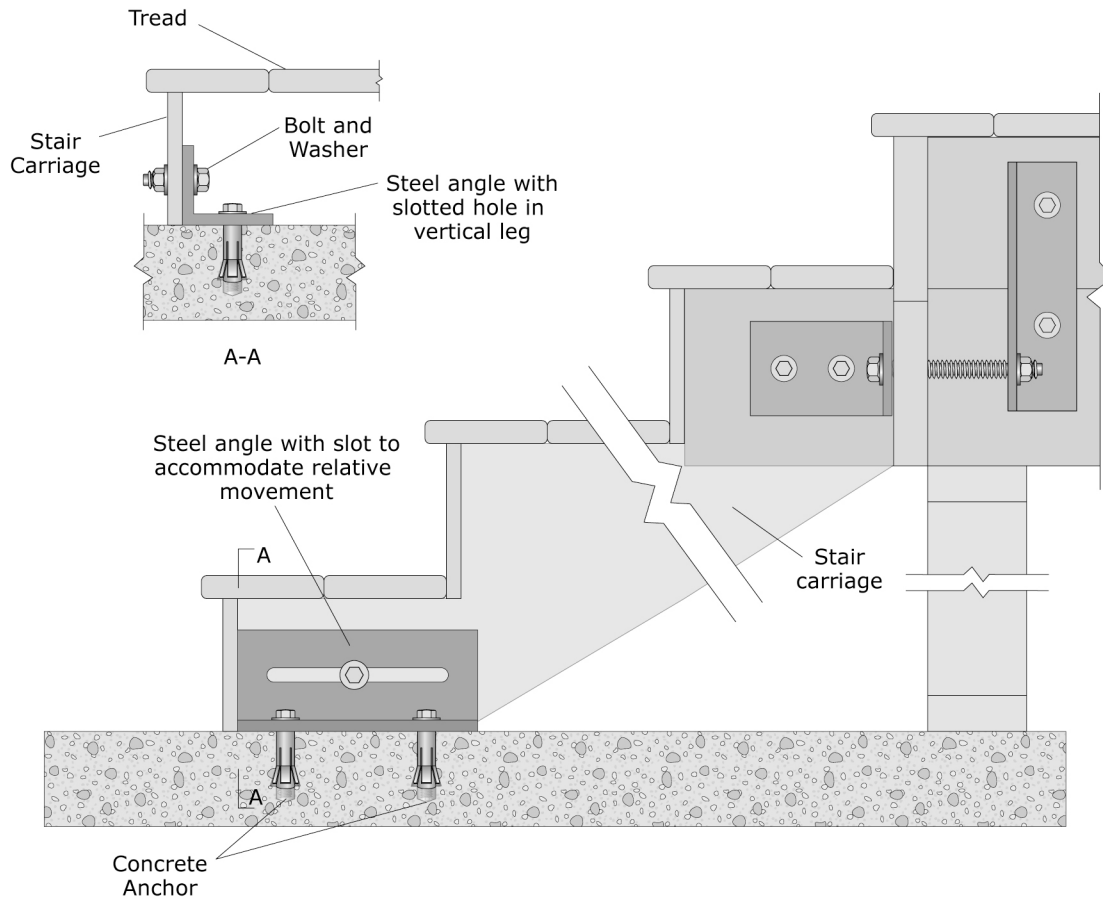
Example slip connection for wood stair with single run between floors (ER).
